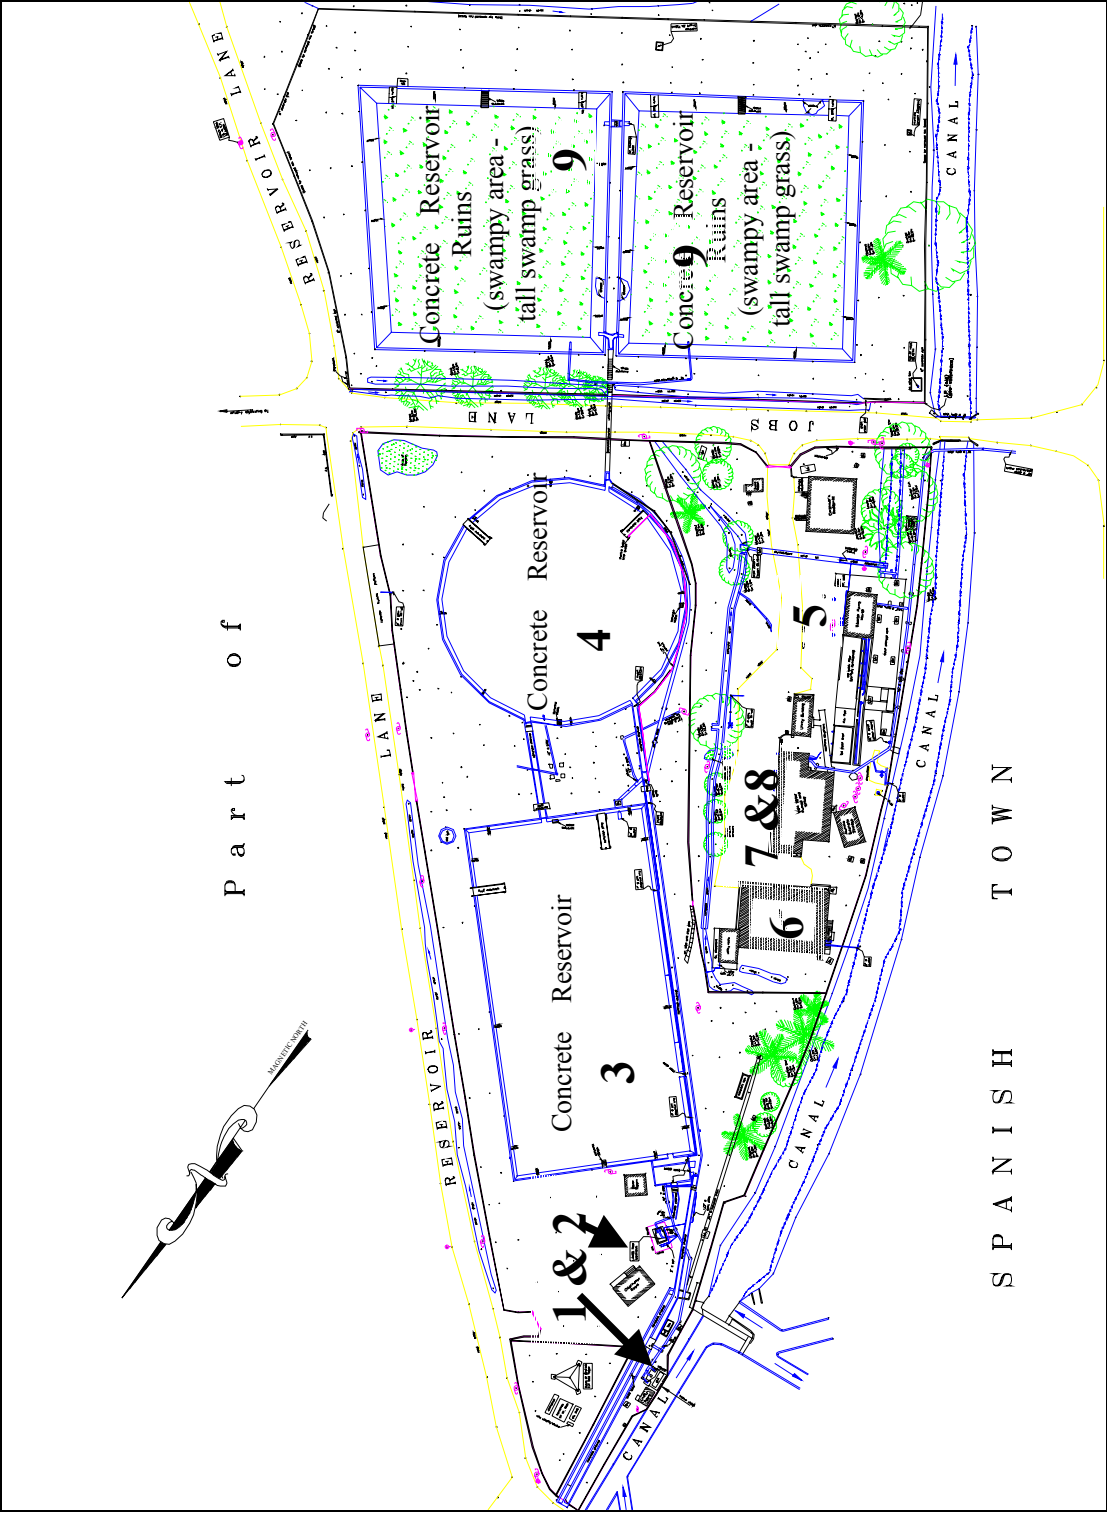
^[7] - Layout of Existing Spanish Town Water Treatment Plant
